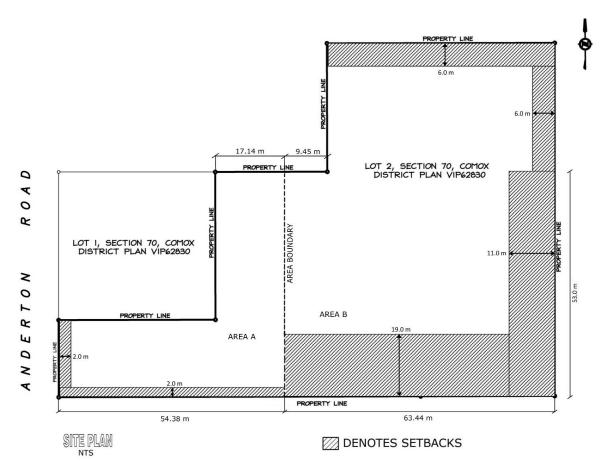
640 Anderton Commercial/Mini Storage Sub-Areas and Setbacks
